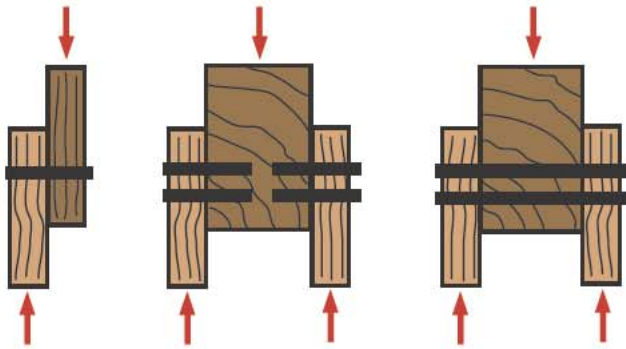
These connections are typical connections in a wood-frame building: a shear force is applied to the connection. If the connection fails, the parts of the connection will slide past each other.
